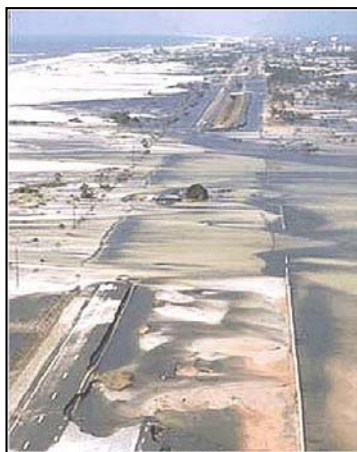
Hurricane Opal's 1995 storm surge and wave height of fourteen to twenty feet washed away roadways and buried them in sand. Notice road washout and sand coverage caused by storm surge and wave action erosion. Photo is of U.S. Highway 98 looking westbound towards Fort Walton Beach in Okaloosa County
